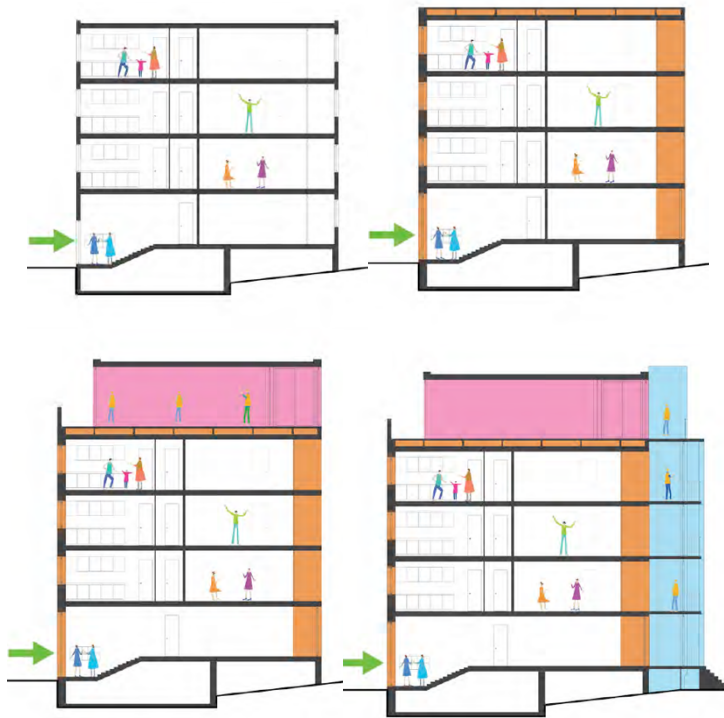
The figure illustrates how the buildings are planned to be renovated. The top left picture shows a section through one of the existing buildings. The top right picture shows how the designers will insulate the thermal envelope of the buildings. The bottom left picture shows how new 'penthouse' apartments will be constructed on top of the buildings. Lastly, the bottom right picture shows how balconies will be constructed to one of the sides of the buildings. (The illustrations are made by the architectural company that designed the 'conceptual design' of the renovation project).
